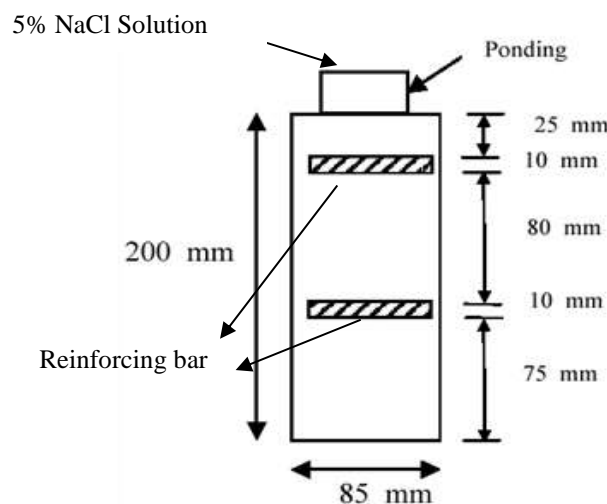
Schematic of ponding test setup for reinforced concrete specimens
